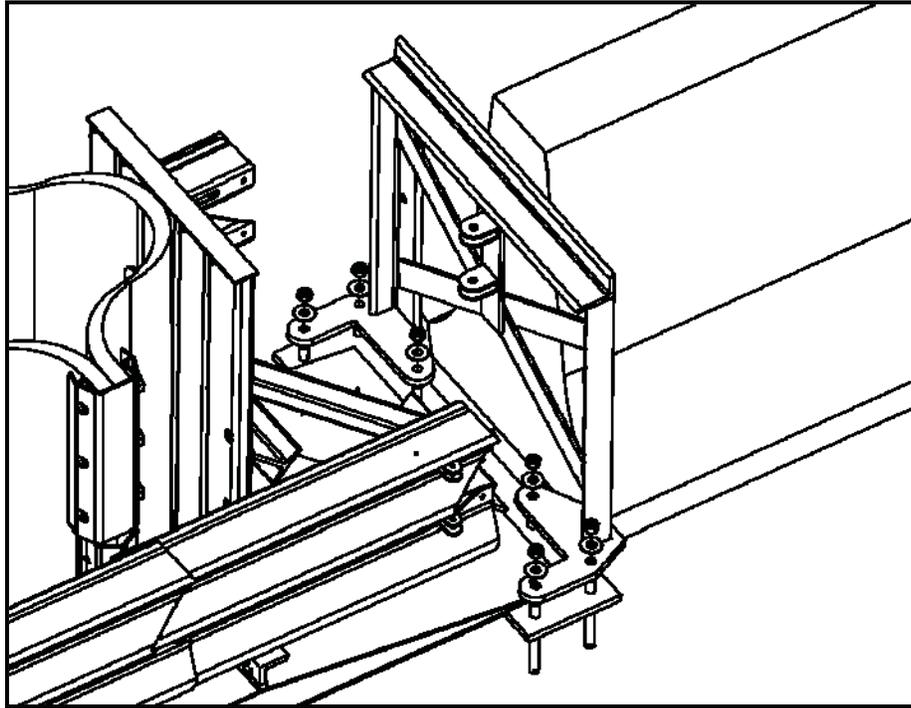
Standing Brace Bolt Installation to Uni-Base Platform
